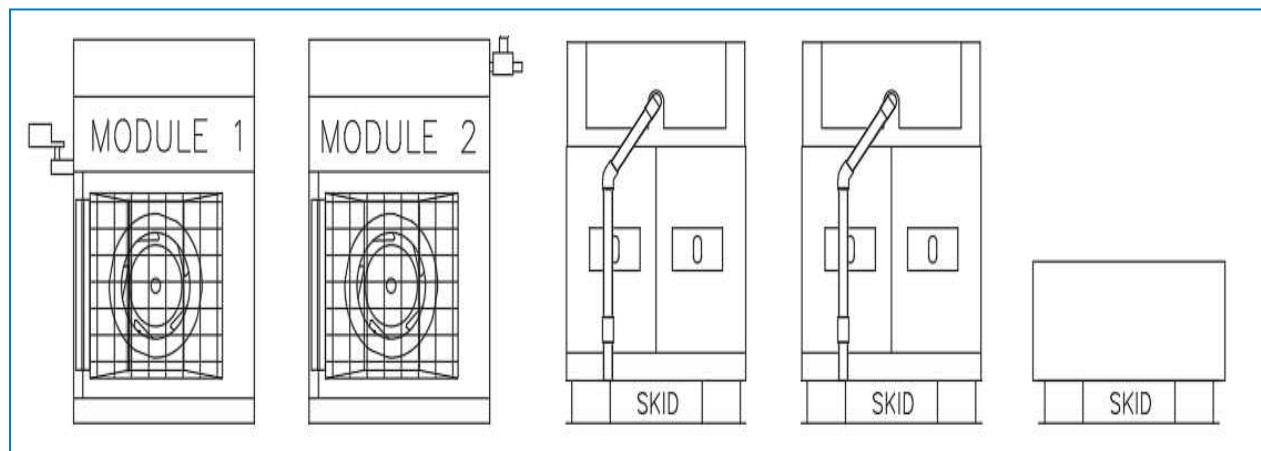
D Modular shipment: Individual modules are shipped with the spray section / heat transfer section removed and are connected, assembled and wired on-site
